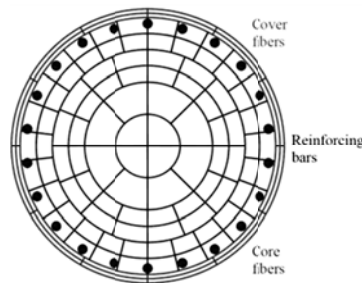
Fiber cross section; typical arrangement of fibers for a solid circular section
